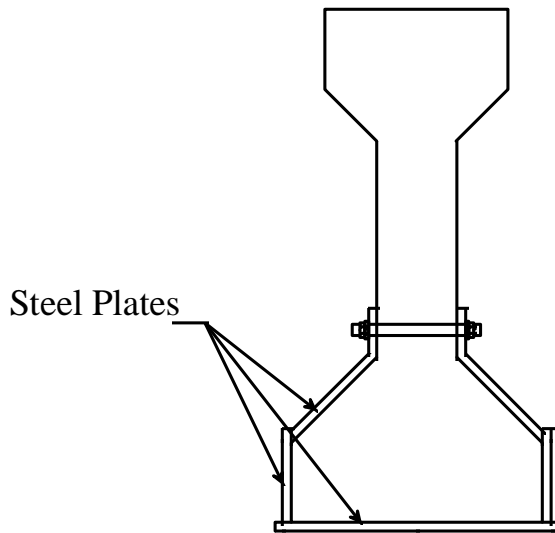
Metal sleeve splice jacketing the girder at the location of the severed strand (48)
